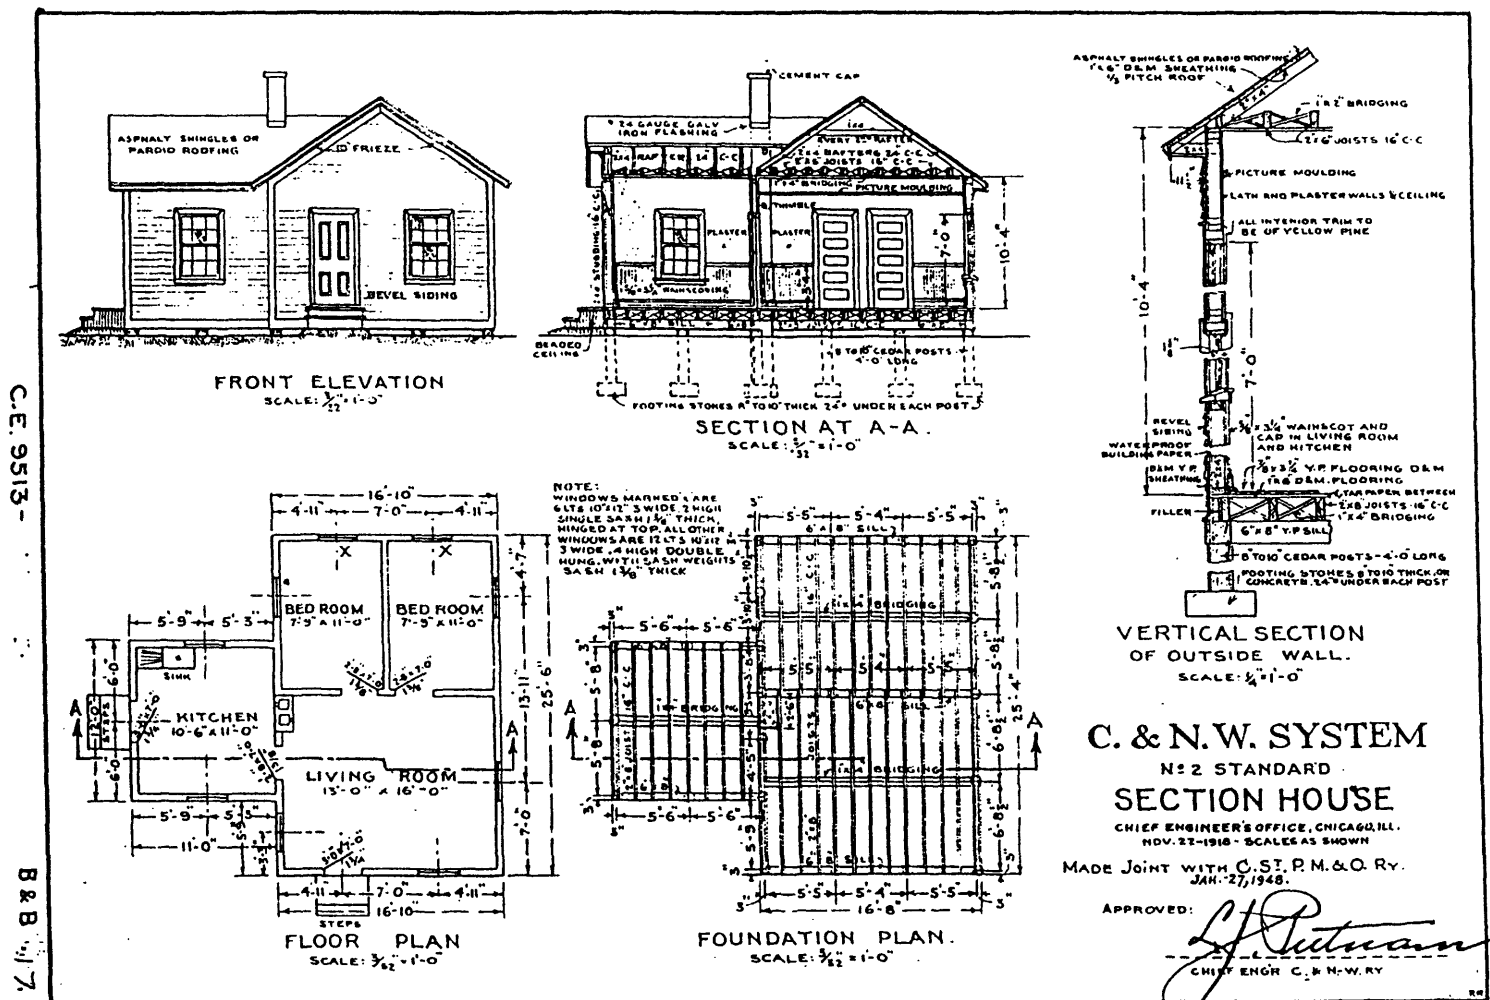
standardized section house design from the Chicago, & North Western Railroad
